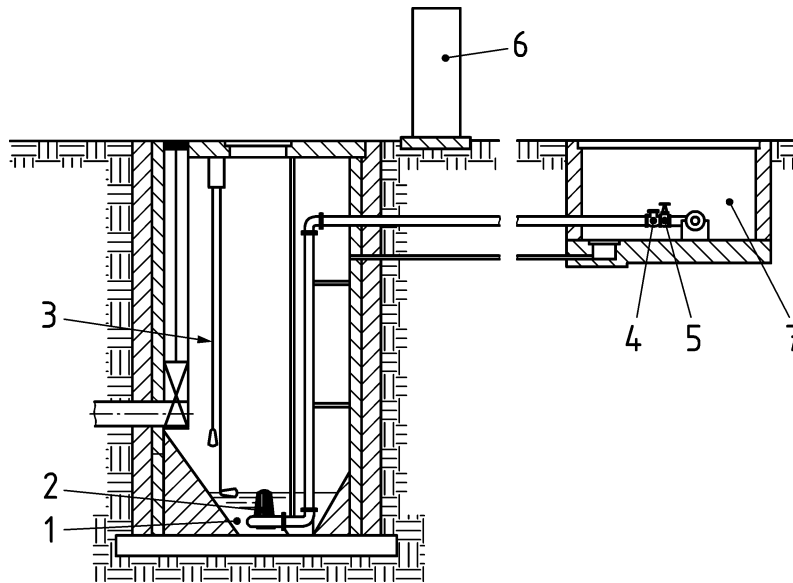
Example of pumping station with submersible pumps and no external valve chamber
